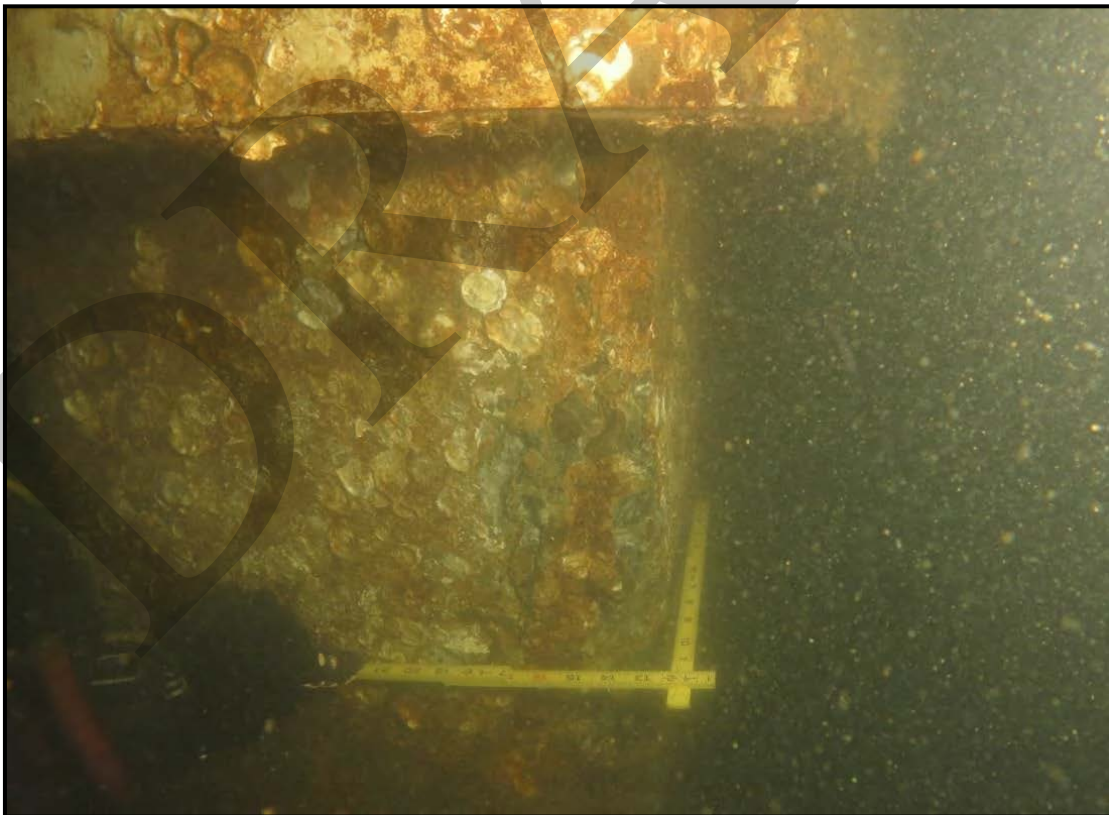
Deterioration of original concrete pile exposed below encasement repair.
